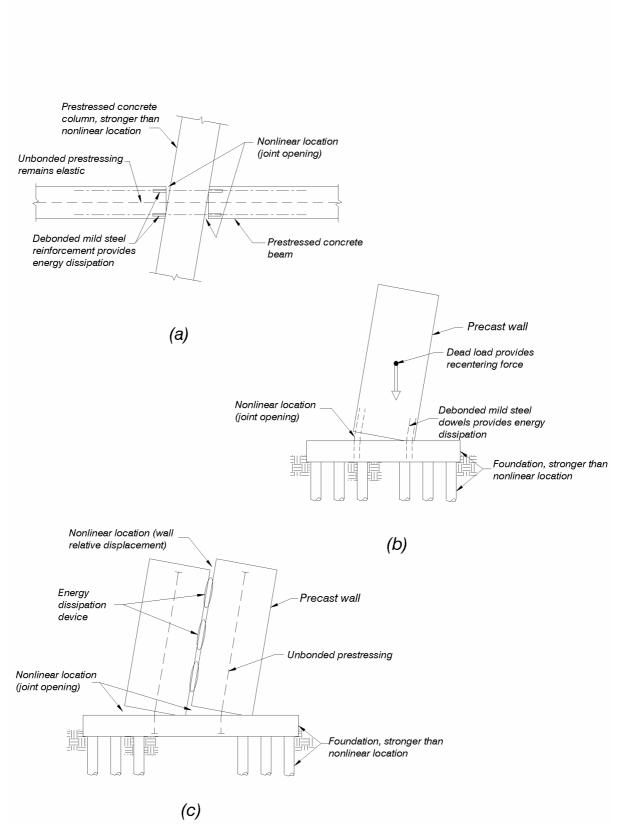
Examples of jointed hybrid precast systems: (a) moment resisting frame, (b) wall with dowels, (c) wall with unbonded prestressing and energy dissipation devices
